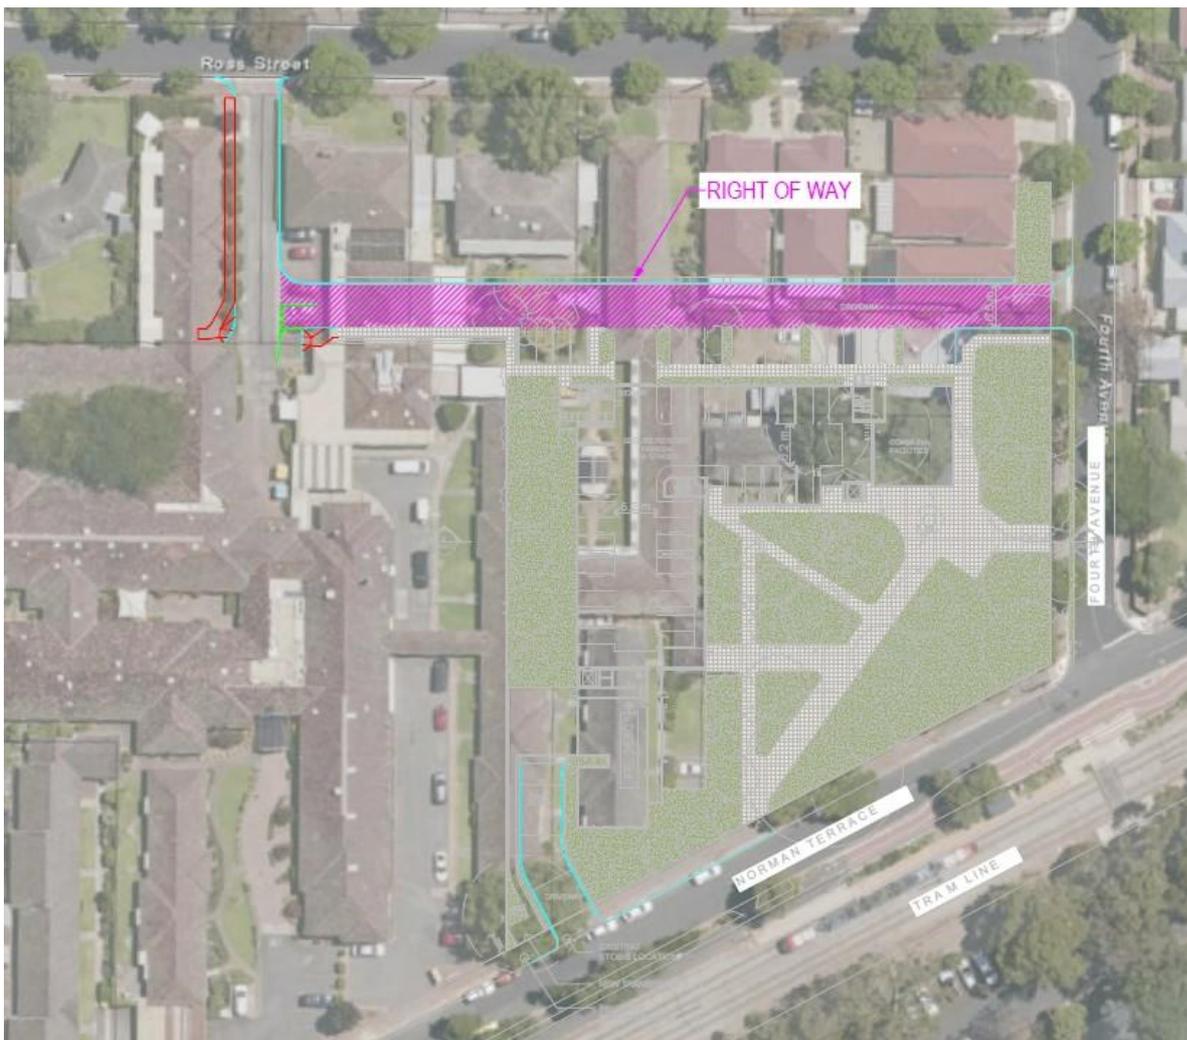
Proposed right-of-way to provide access to adjacent proposed residential care facility
